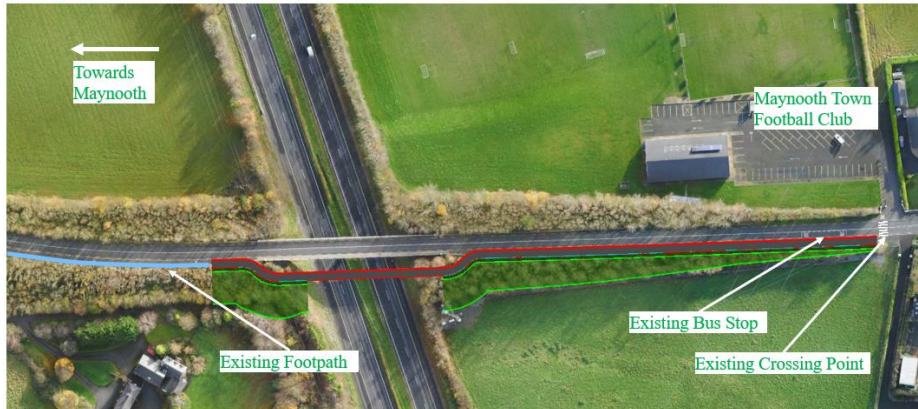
Option 1 - Active Travel Overbridge west of the existing R408 Newtown Road Overbridge
